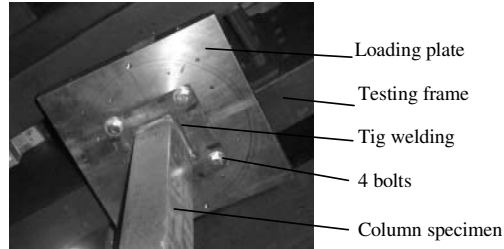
Column end cross-section fully fixed against the test frame loading plate.
